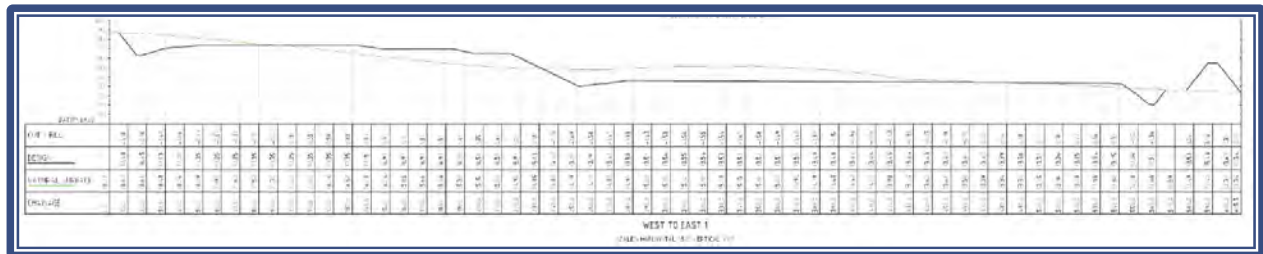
Site slope and drainage (Source: Price Merrett Plan Sheet 7)
